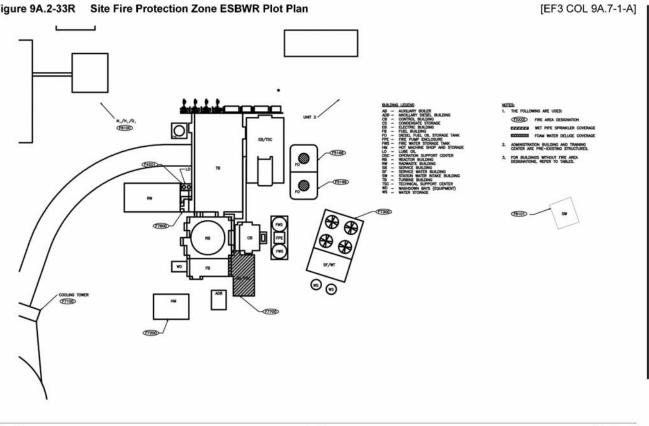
A.2-33R Site Fire Protection Zone ESBWR Plot Plan
